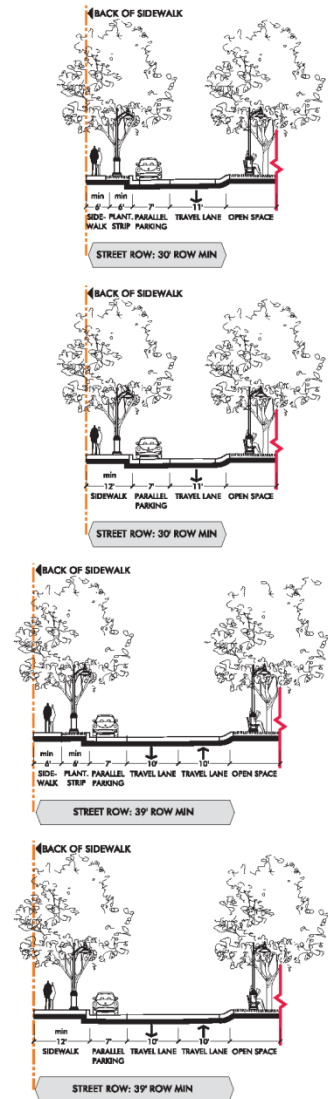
Public Open Space w/ Neighborhood Street
